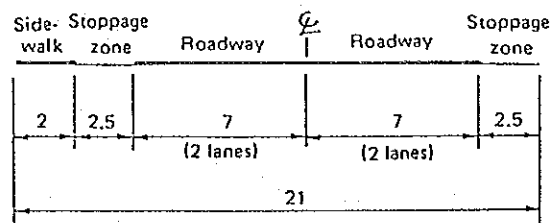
Cross Section of Main Road at West Quay (W-Section)
